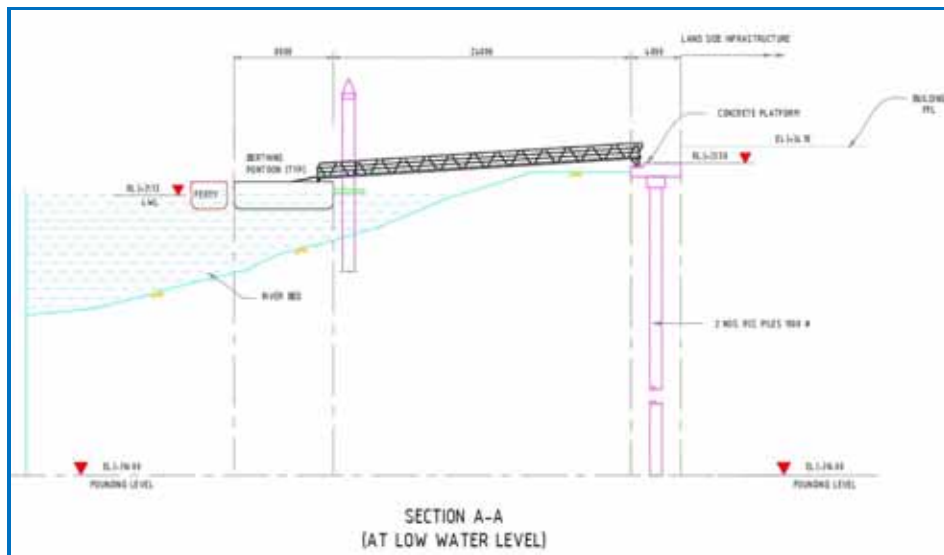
General arrangement of berthing pontoon at Low Water Level (Sadasivgad & Katne)
